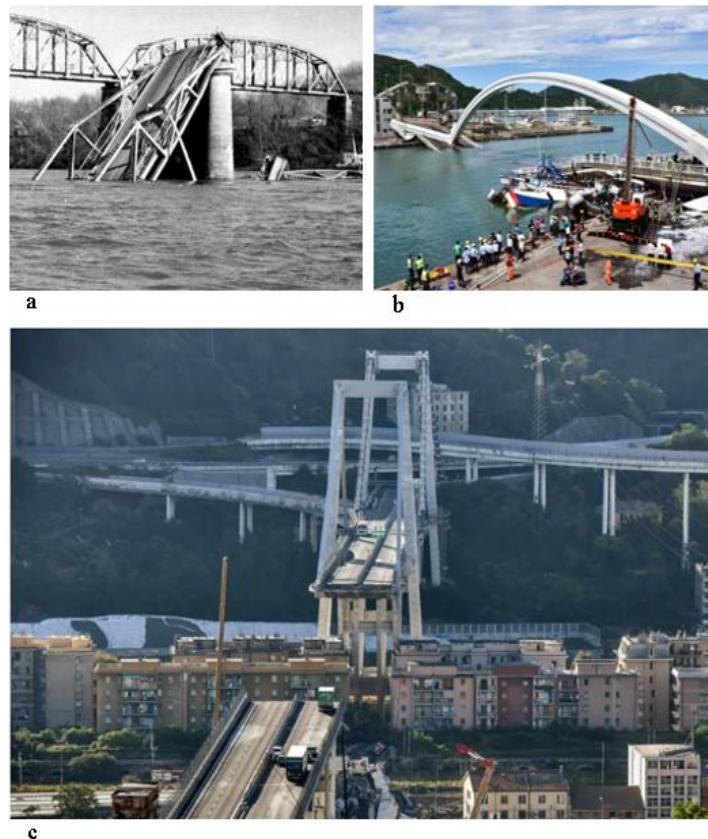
a) Silver bridge collapse (1967) [1] ; b) Taiwan bridge collapse (2019) [2];
